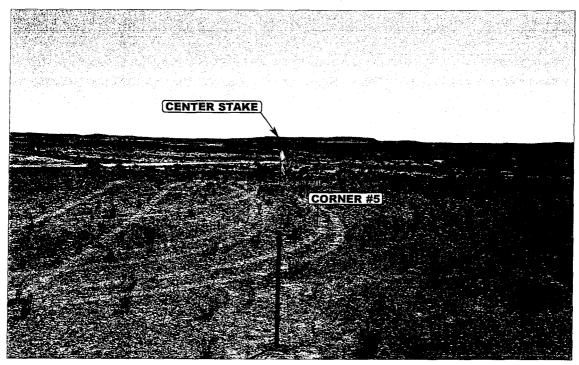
PHOTO: VIEW FROM CORNER #5 TO CENTER STAKE
